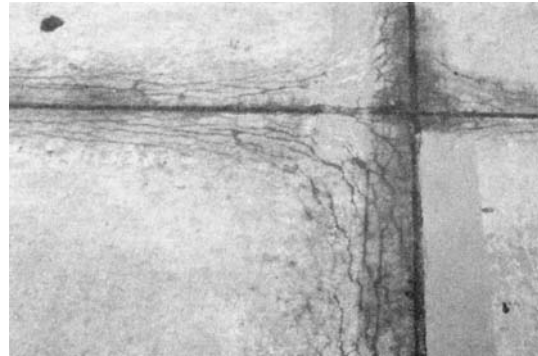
Cracks in concrete pavement with moisture present (ACI 201.1 R92)
